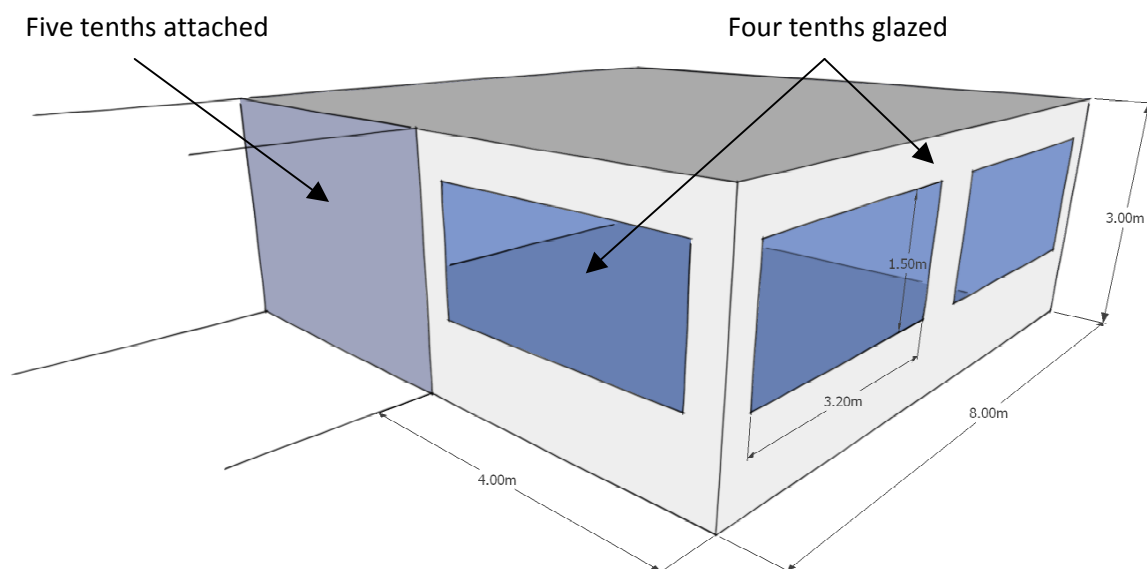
Illustration of two façades, both with four tenths glazing, where one façade also has five tenths attached wall.
